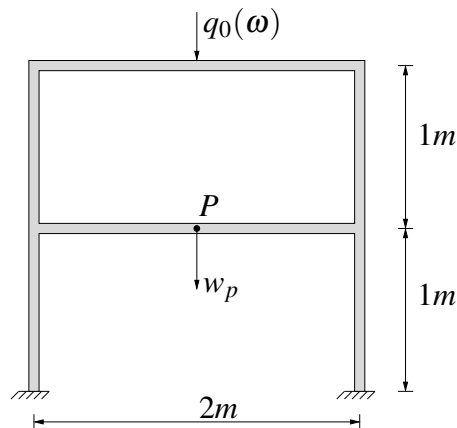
Plane frame of six rigidly fixed beams: Geometry, support, and loading
